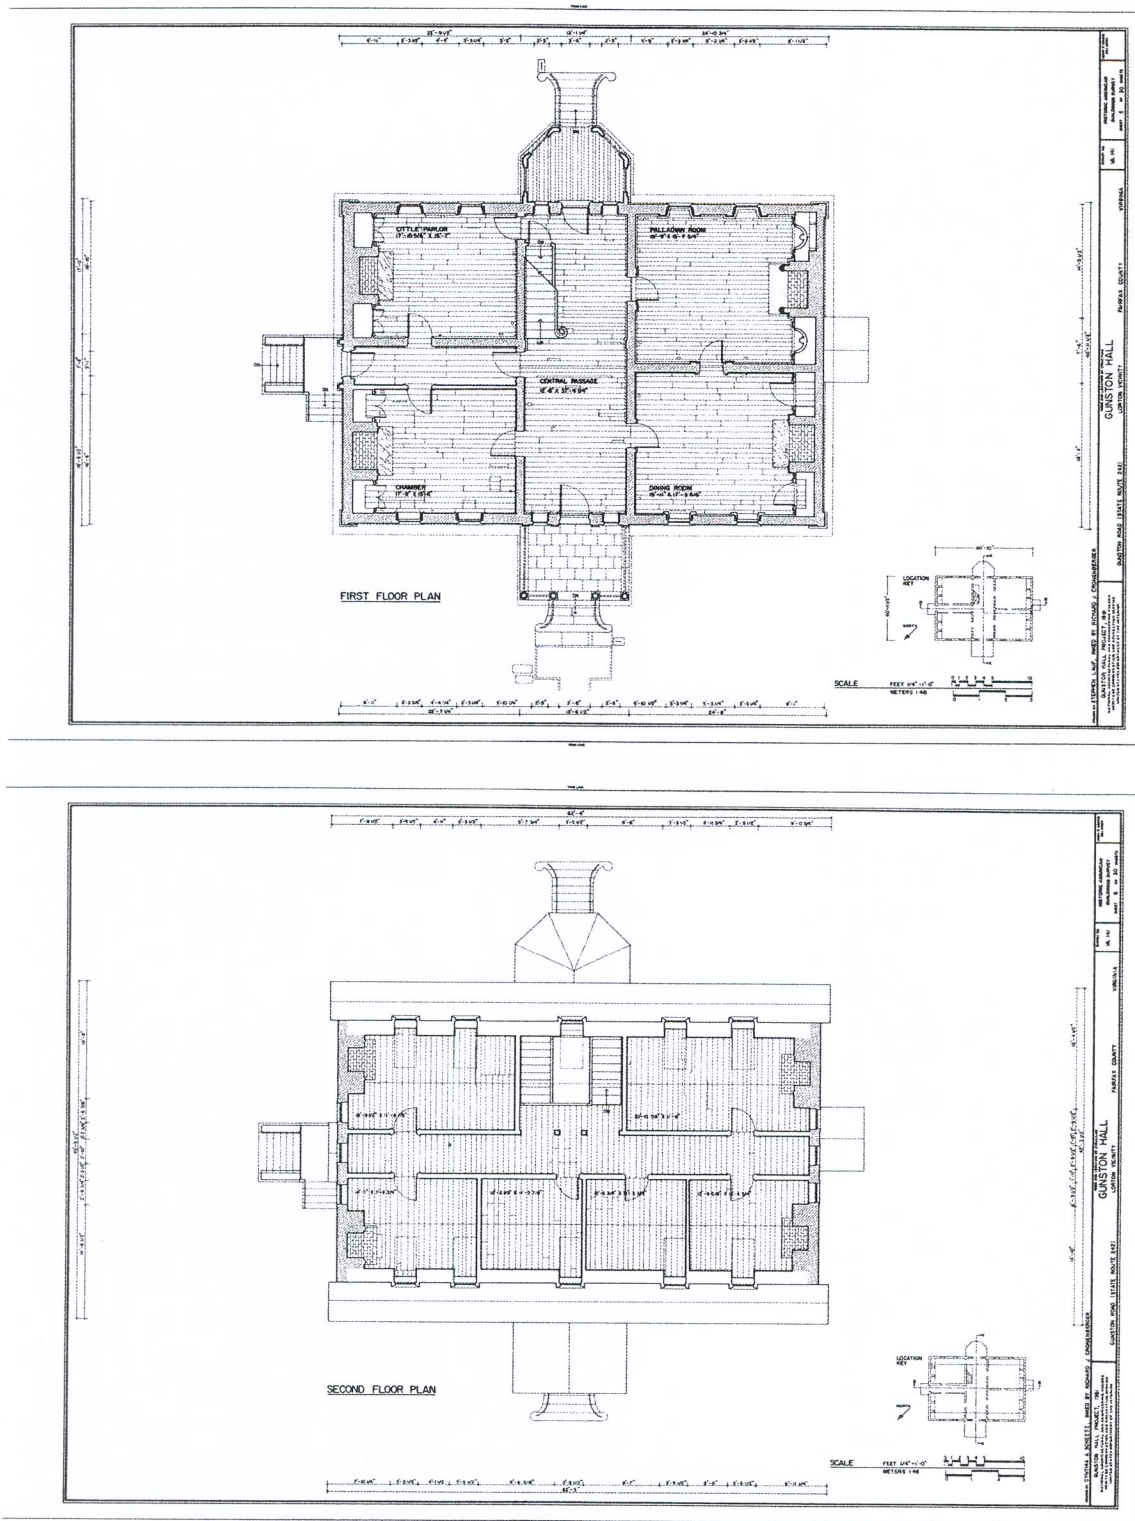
(a) & (b): Gunston Hall, First and Second Floor Plans, HABS Collection, Library of Congress
